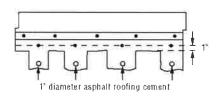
Fastening Presidential and Presidential T/L Shake shingles on steep slopes.
